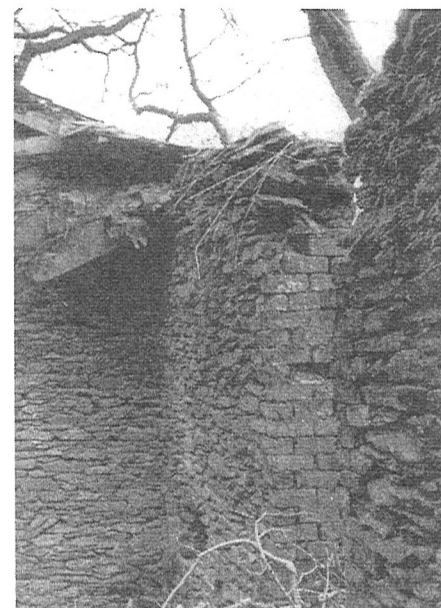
Allan & Mann bricks around an opening in a wall of building 9 in figure 2. Courtesy of Glenys Crocker.
